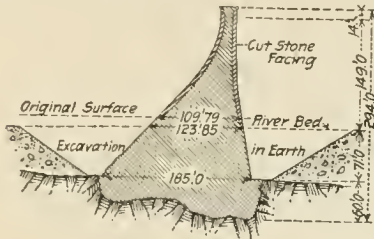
CROSS-SECTION OF A MASONRY DAM
